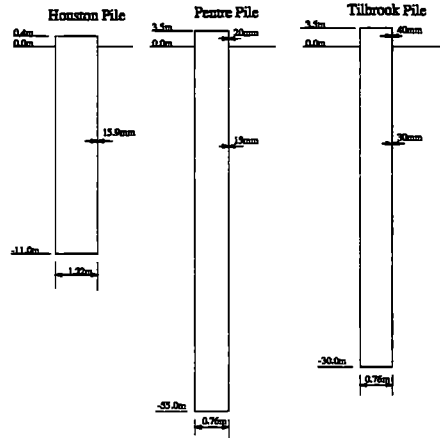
Pile Layouts at Houston, Tilbrook and Houston sites
